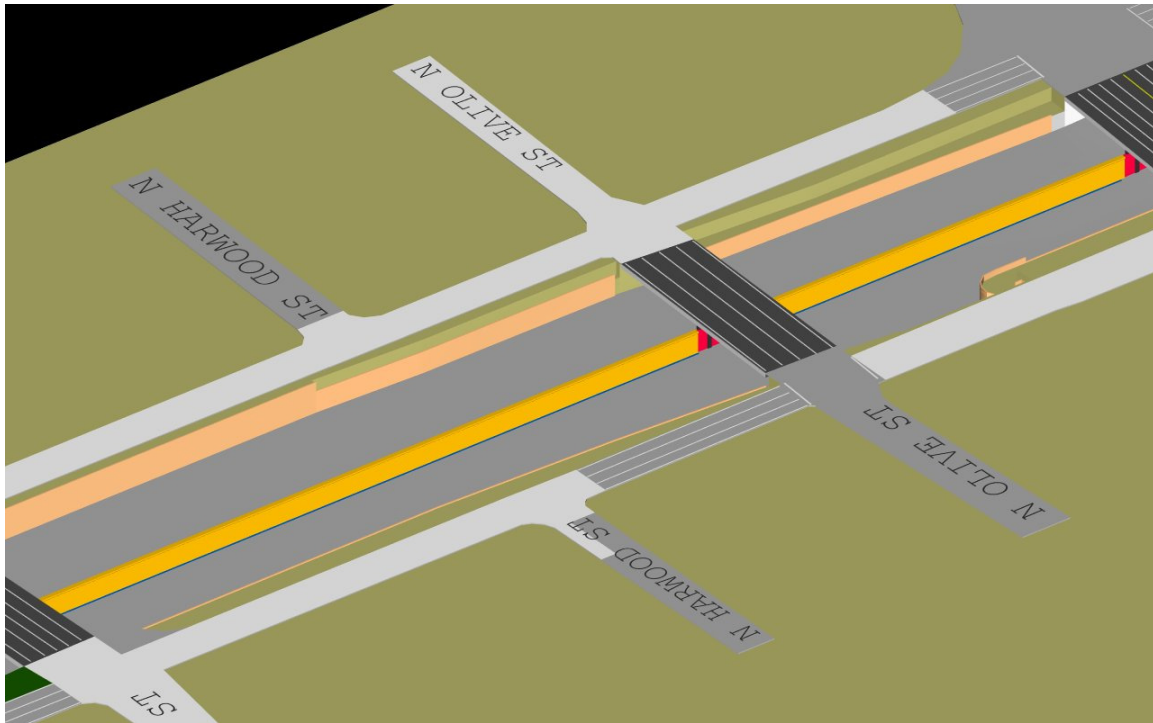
Construction of Center Bent Wall and Frontage Road Pavement
